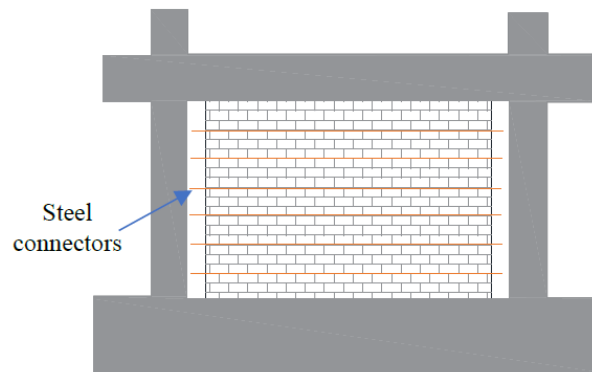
Isolated masonry infill with steel connectors (Kuang and Wang 2014).
